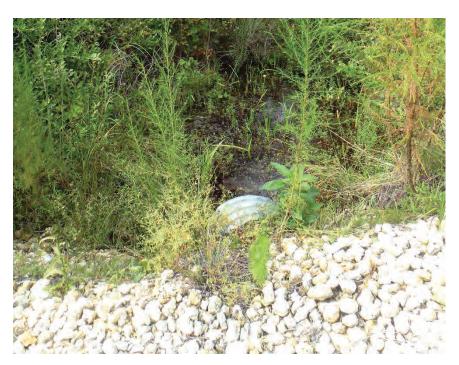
View of Physical Feature: Culvert located on north side of road at GPS location 1272 (Frame 1835; 08/27/15).
